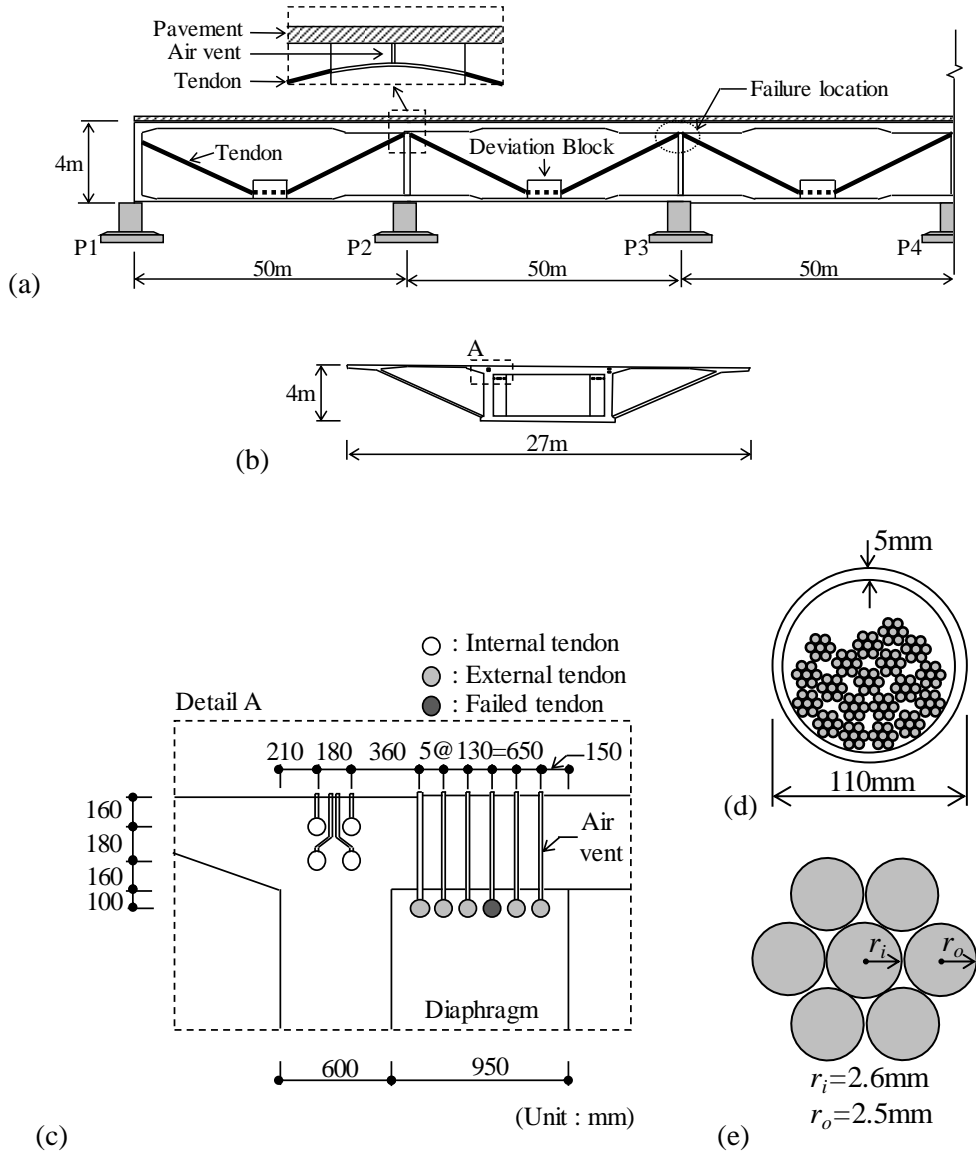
Overview of the bridge: (a) side view; (b) section view; (c) close-up view of box A in (b); (d) cross-section of external tendon; and (e) cross-section of 7-wire steel strand
